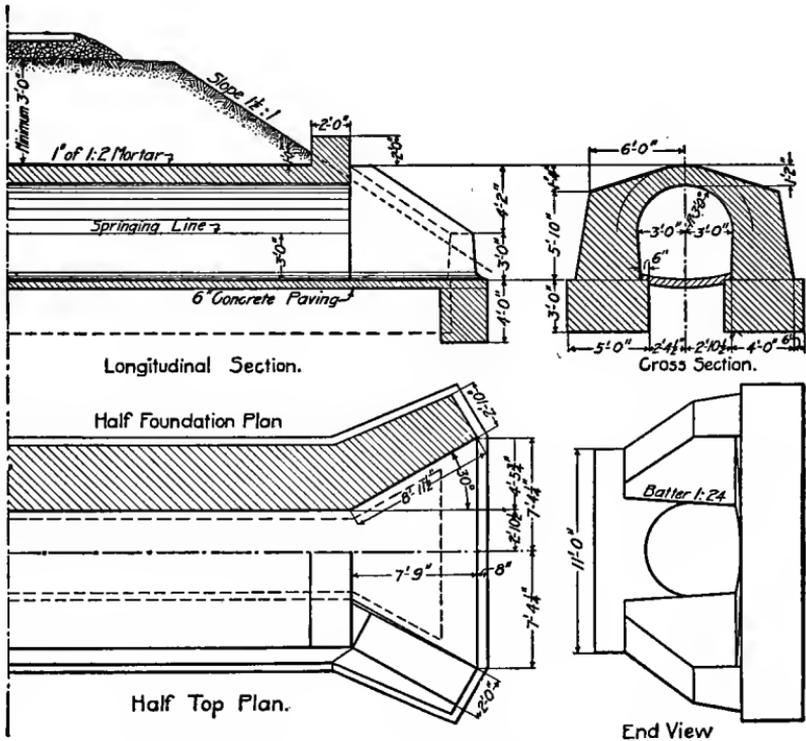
C. C. & O. RY. PLAIN CONCRETE ARCH CULVERT.
